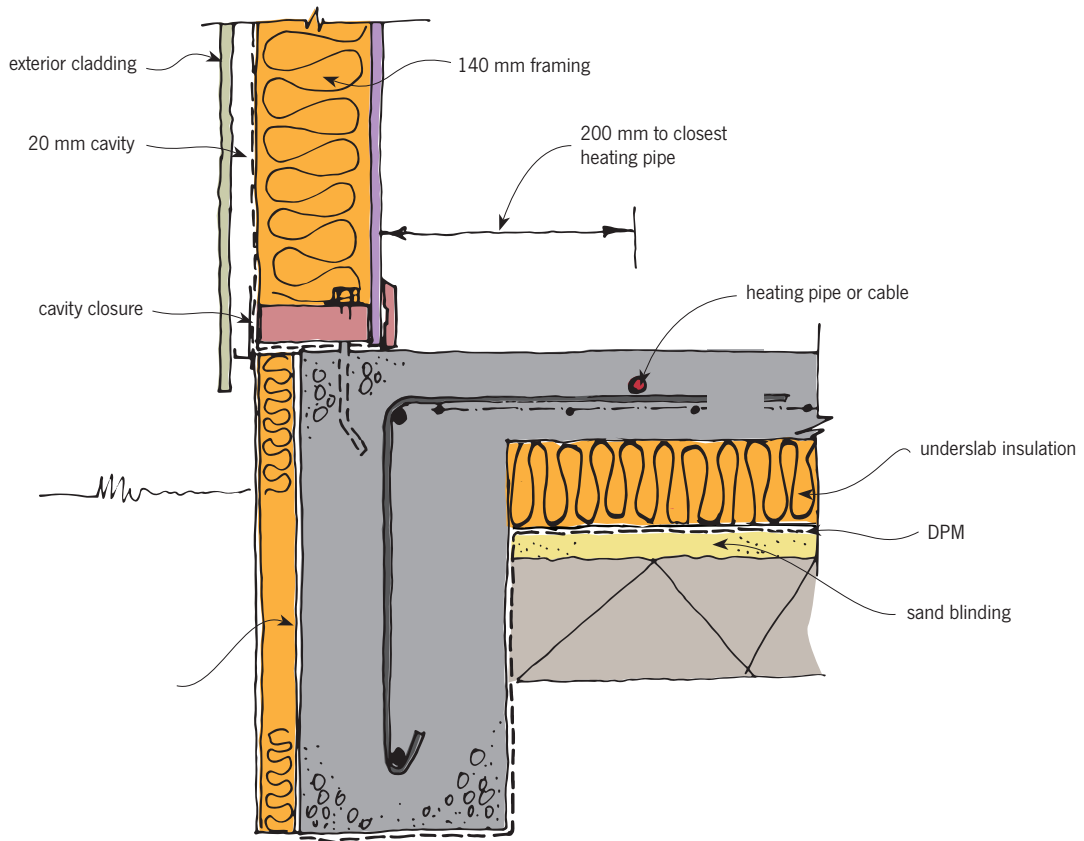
Insulation applied to exterior face of foundation wall with protective plaster or tile finish for cavity construction and 140 mm or wider framing.
